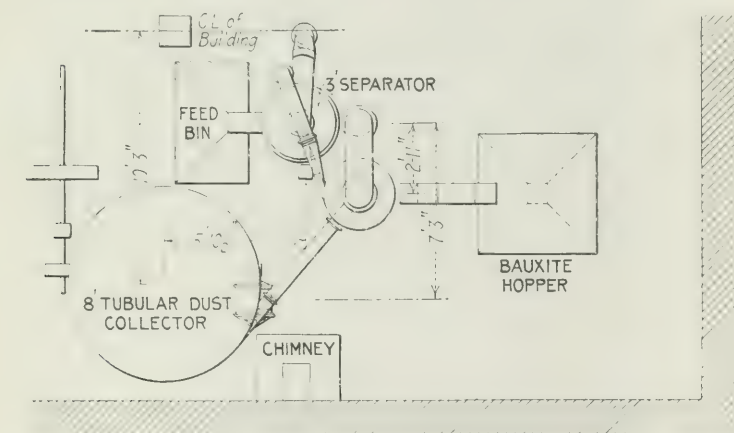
DETAILS OF BAUXITE PULVERIZER, OMAHA ALUM PLANT
